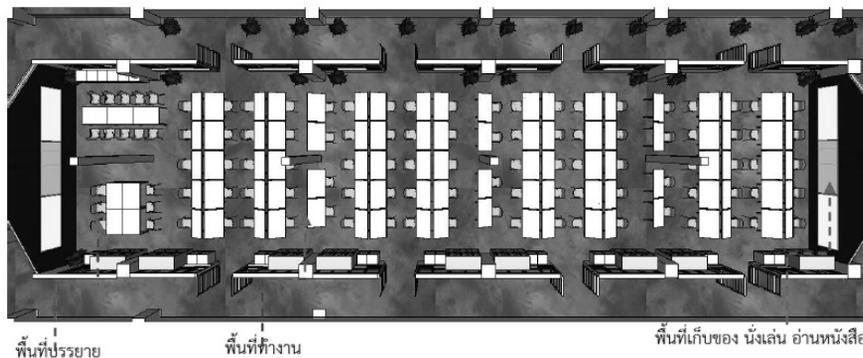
Furniture lay out AR-508 (Floor 5) studio type 1
